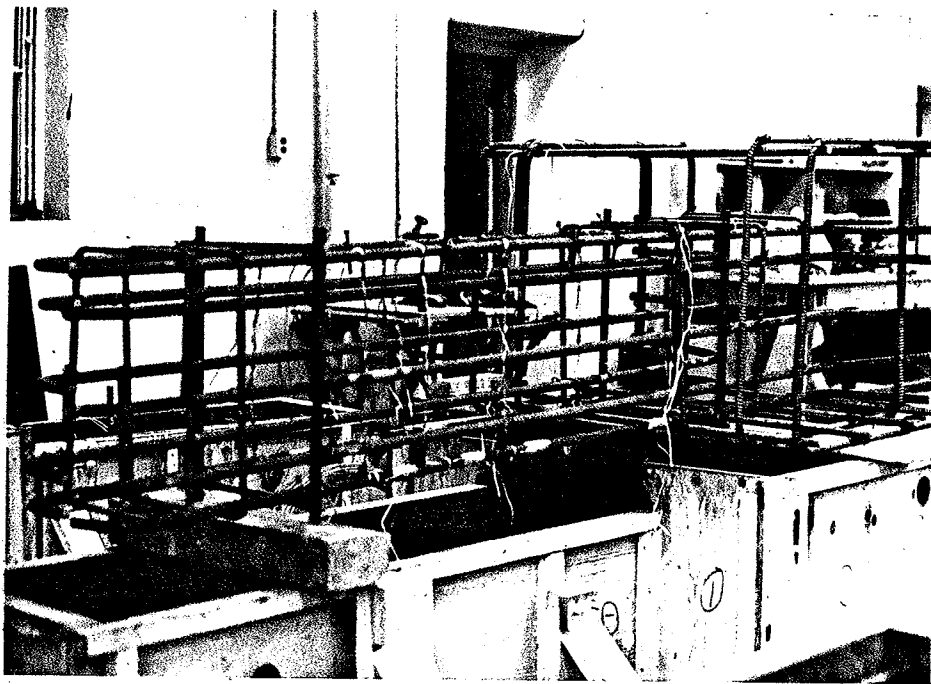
A TYPICAL SPECIMEN REINFORCEMENT
